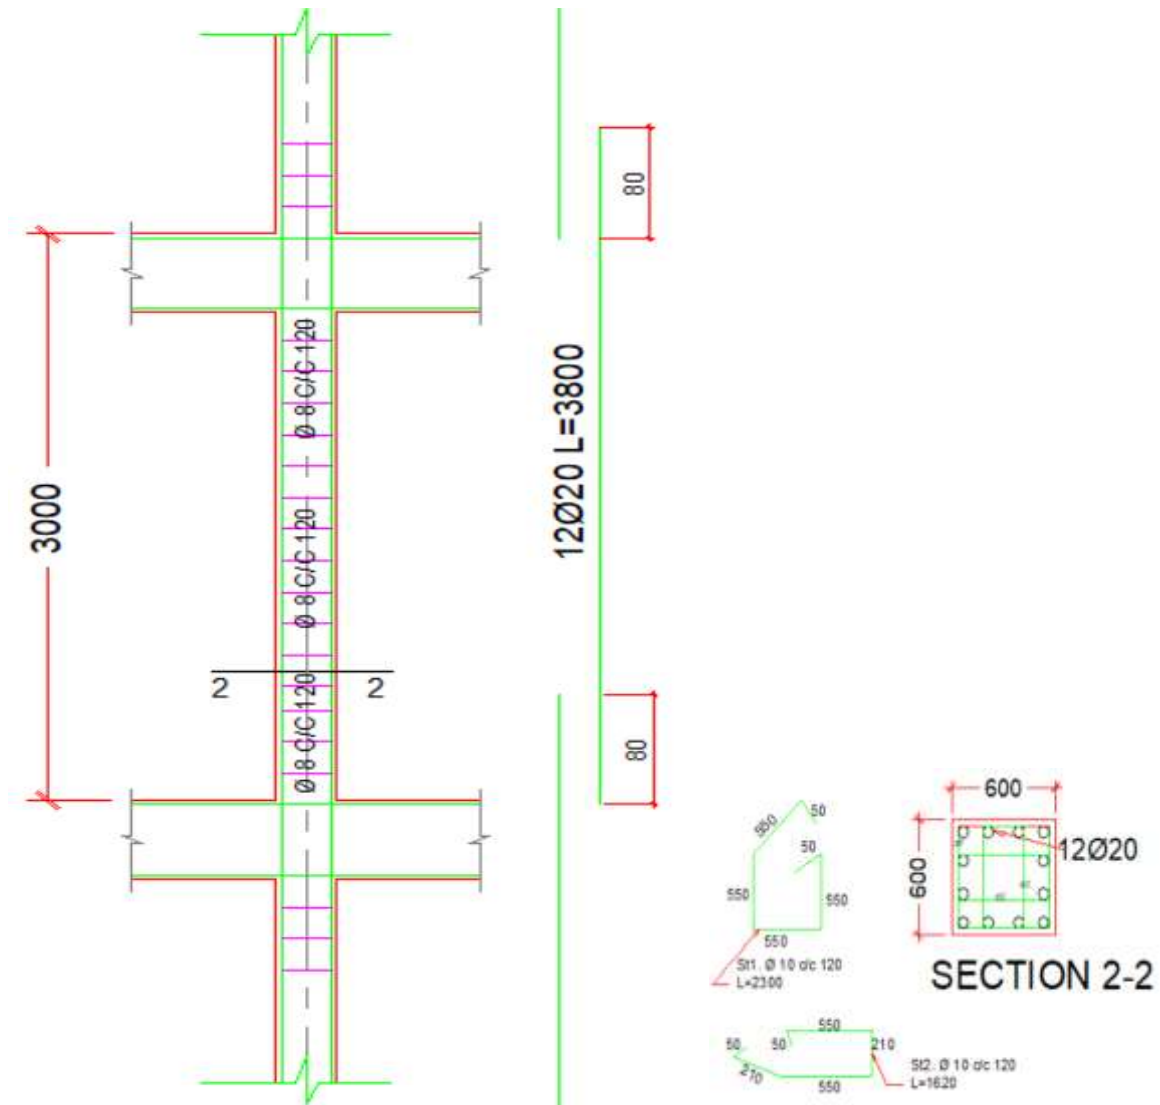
Sample detailing of a column in DCH favorable mode
